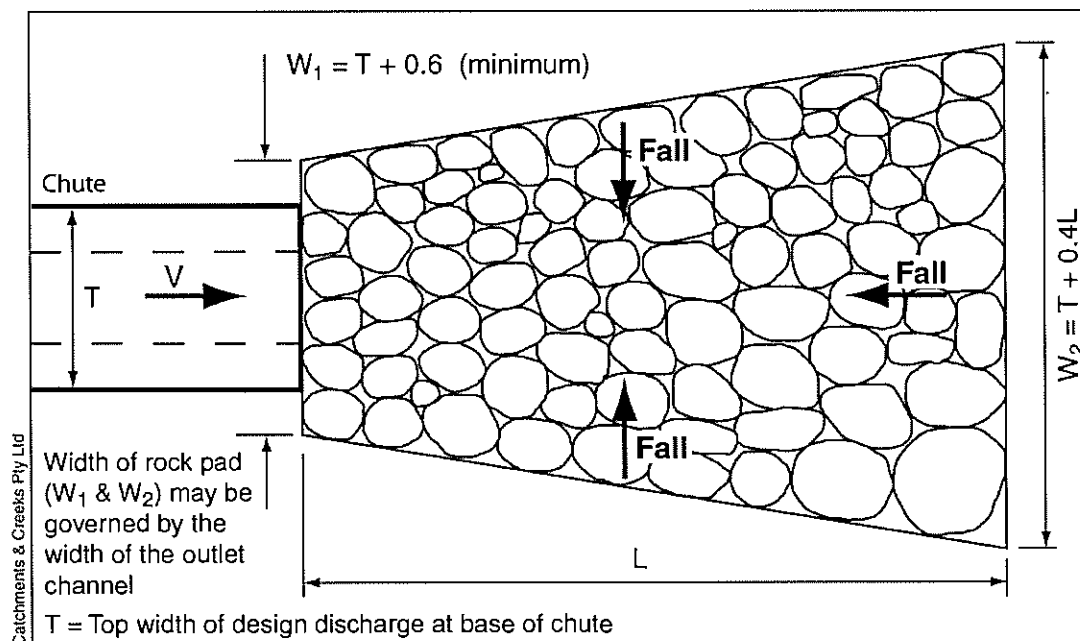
Typical layout of a recessed rock pad for a *Chute* (plan view)
